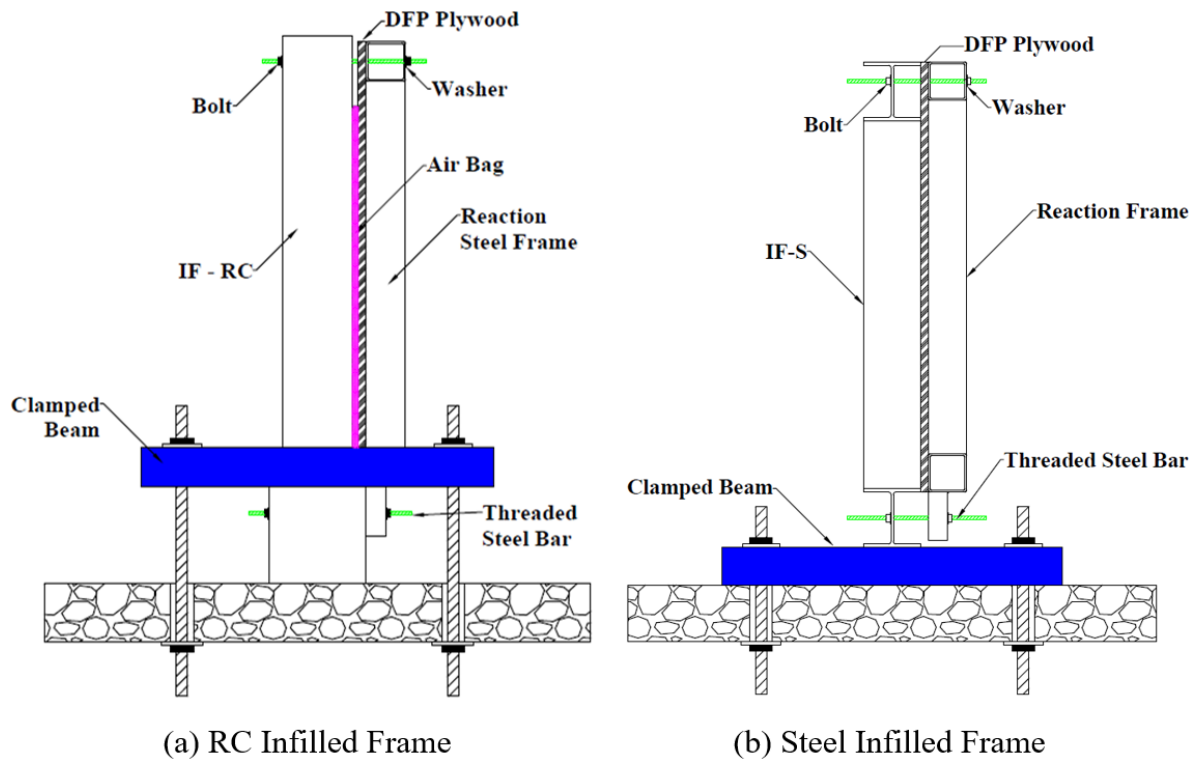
Schematic Side View of Test Set-up for Infilled Frame Specimen
